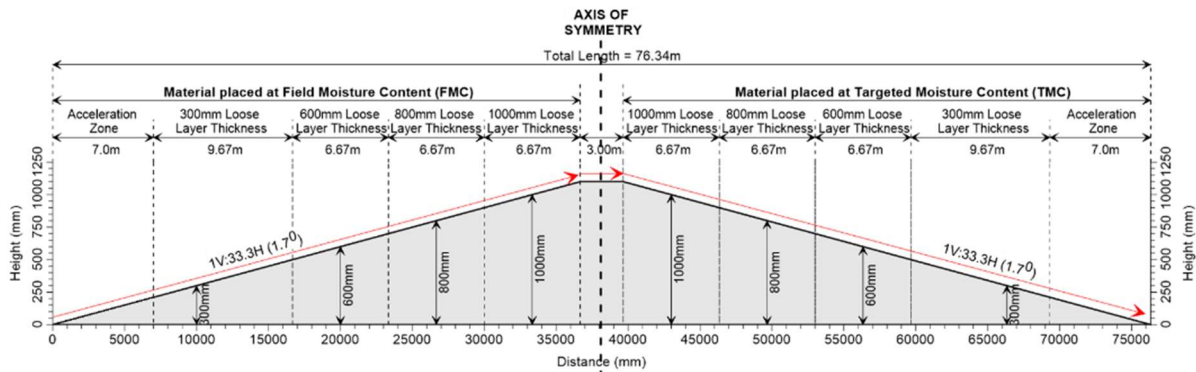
Cross section sketch of TRSC T1 (Lacey and Look, 2016)
